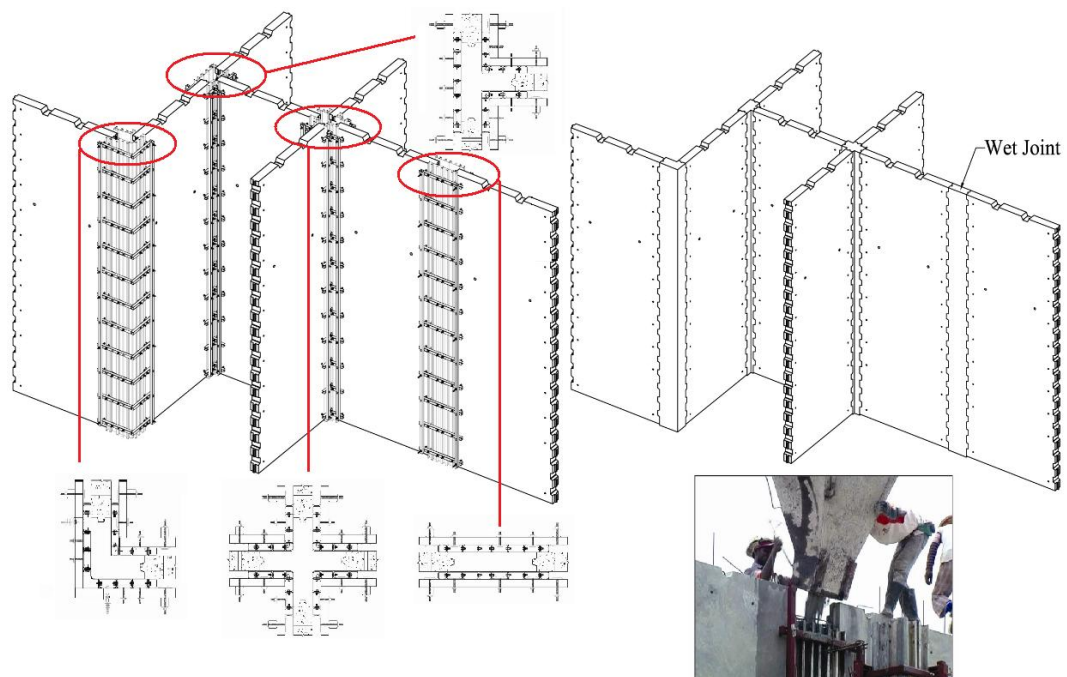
Wet joint casting at site forming columns as well as vertical connections
